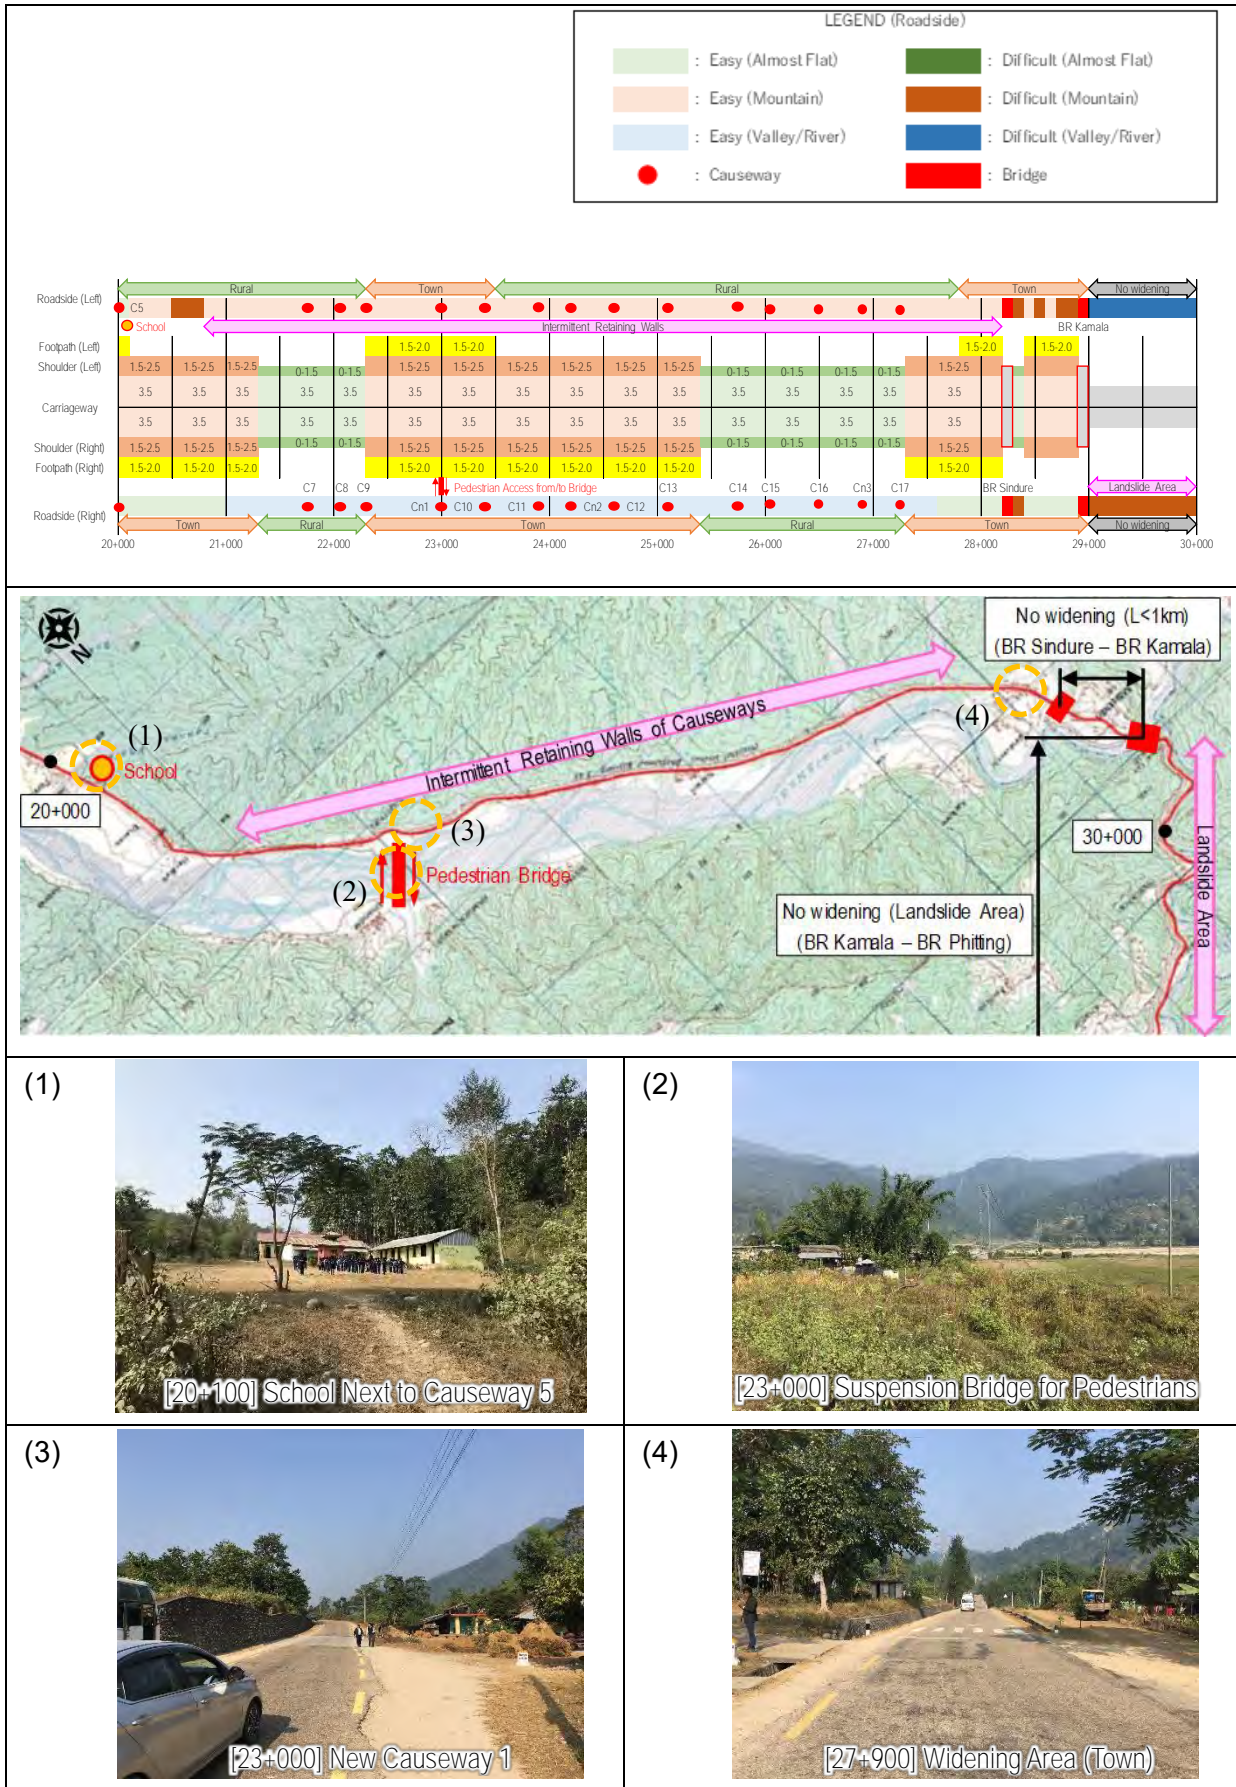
Example of Application of Cross Section Type (Ch.20-30km)
